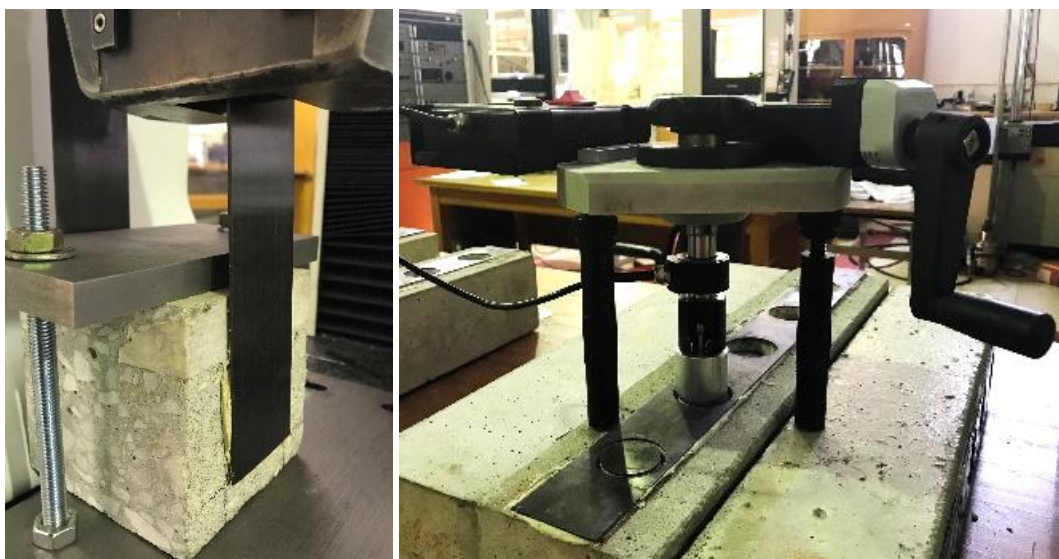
Lap tests and pull-out tests to assess the bond between concrete substrates and CFRP strips used for structural strengthening.
